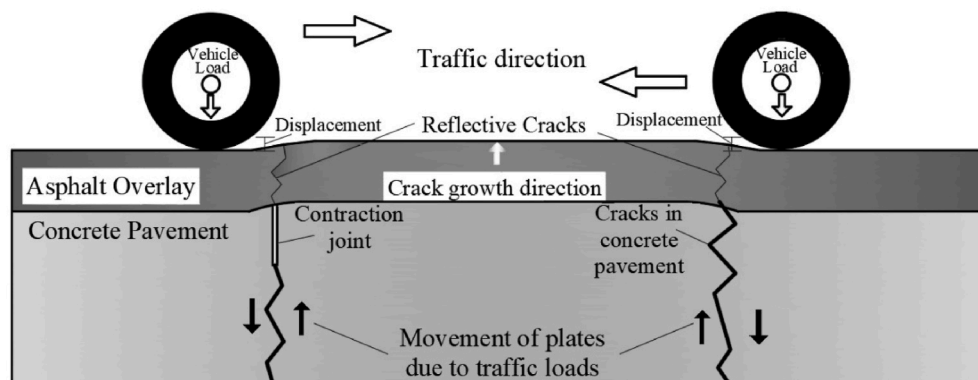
Reflective cracks developed by the cracks in the joints or concrete pavement.
